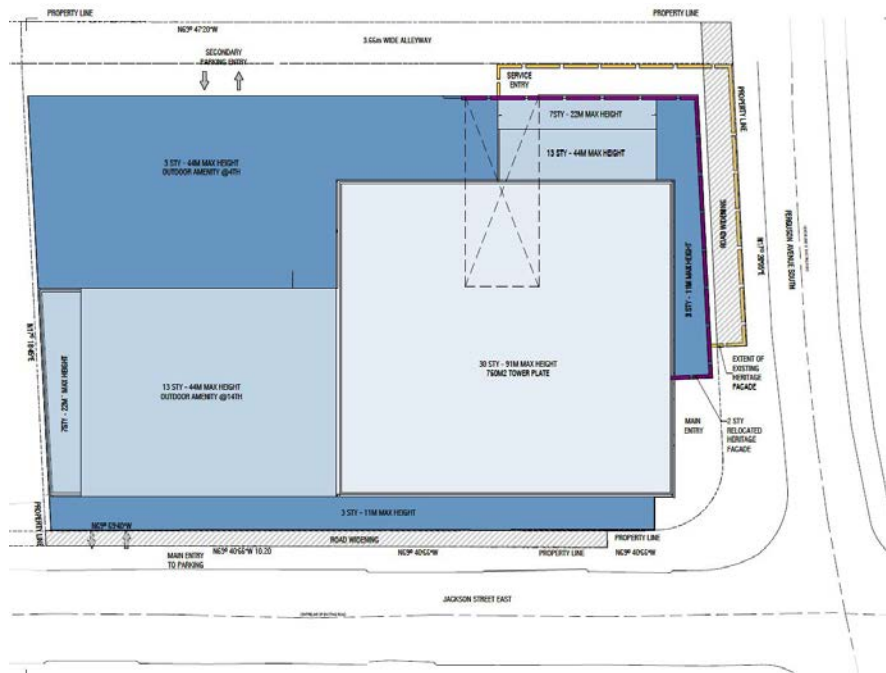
Conceptual Site Plan by G+C Architects indicating the heritage portion of the original building (shown in yellow dash line) to be reconstructed (shown in purple dash line).
